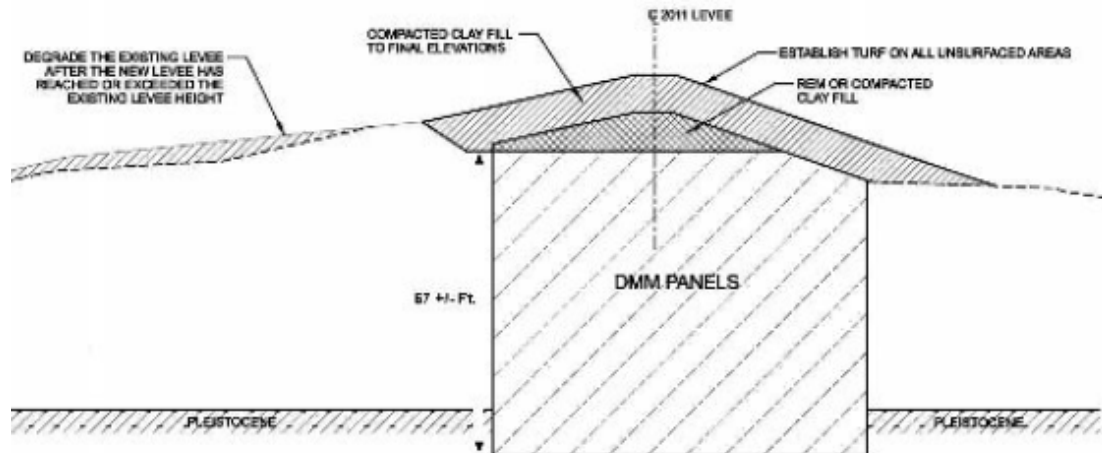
Alt. C – Profile View of the Deep Mixing Method, DMM, Panels Which Illustrates How the DMM Side Walls of the Submerged Box Culverts Can Engage the Pleistocene Layer to Prevent the Possible Formation of a Deep Seated Failure Surface Through the Soil Near the MR&T Levee
